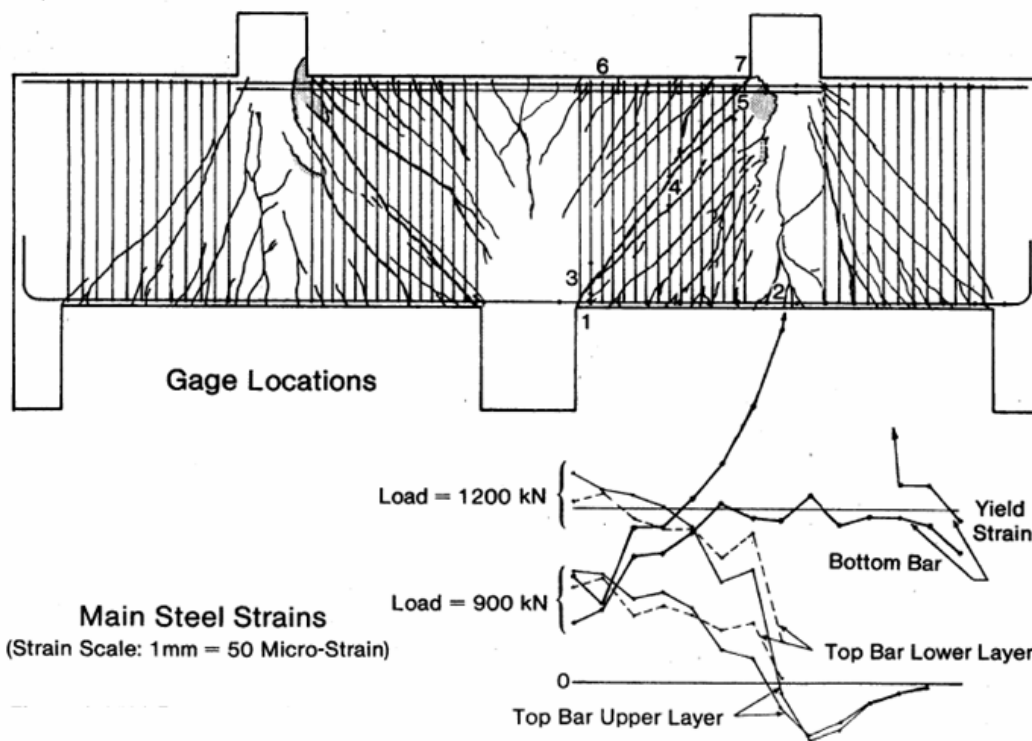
Strains in longitudinal reinforcement and gage locations for the test beam
